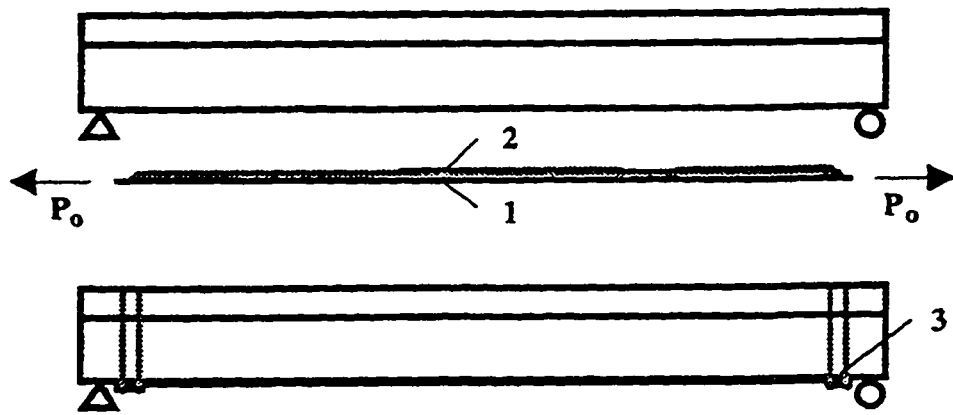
End Anchorages of FRP Plates used to Reinforce Concrete Beams for Flexure (Ritchie et al., 1991)
